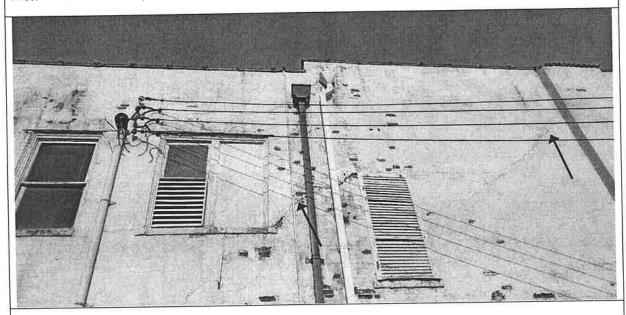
East Exterior Wall: Note significant structural diagonal cracks.
